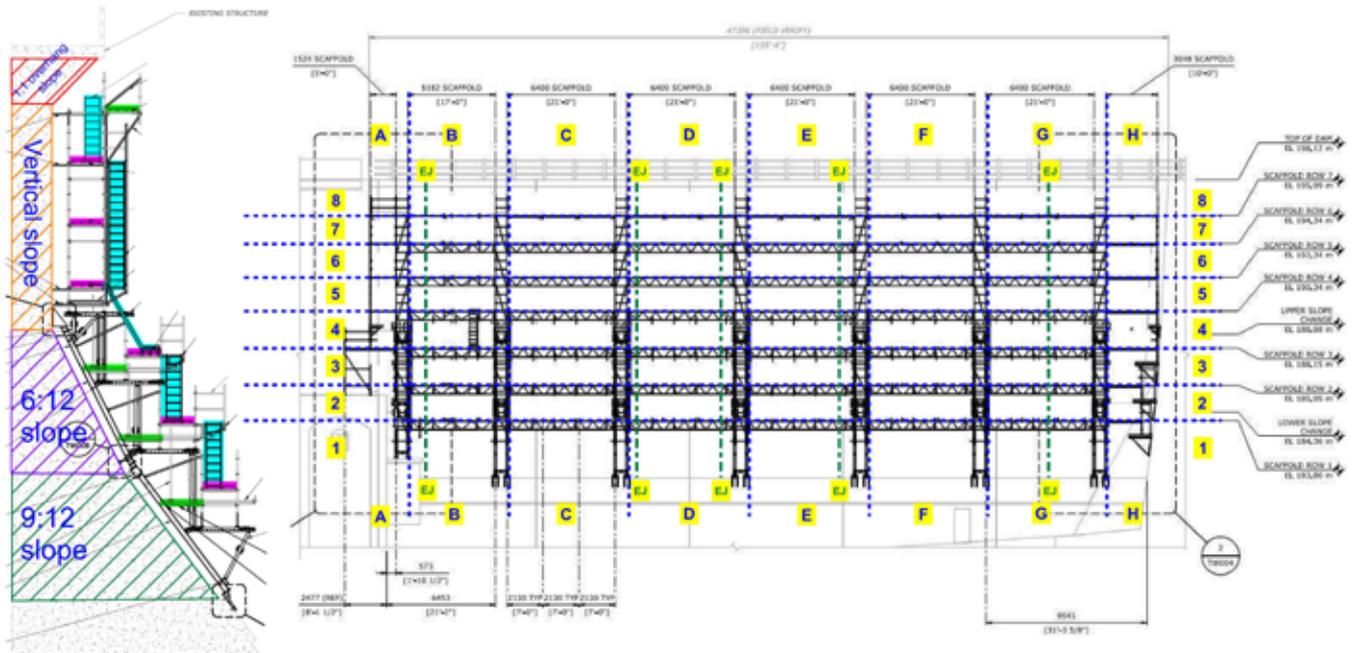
Dam Grid Division — An elevation view of a scaffold system covering multiple dam slopes, emphasizing scope and complexity of access planning
